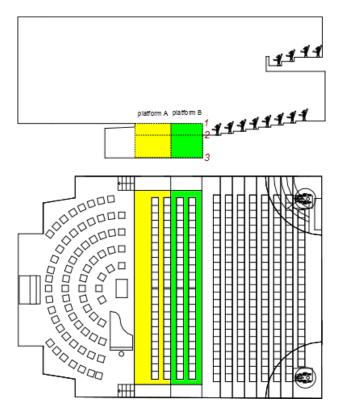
Cross-section and plan view of the concert hall, showing the possible positions (level 1, 2 and 3) of the two lifting platforms, A and B.
